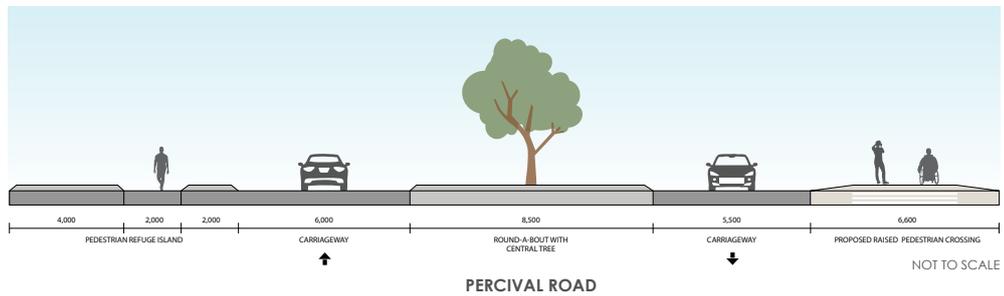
Section H-H: Routes 3 and 4 | Percival Road at Albany Road, looking north
